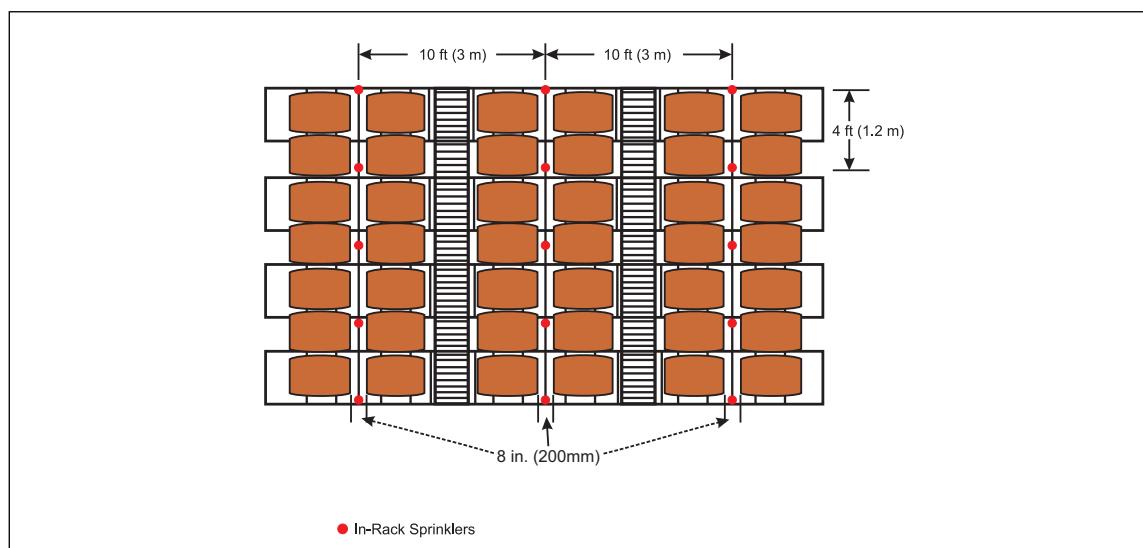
In-rack sprinkler layout for distilled spirits in wooden barrels (plan view)
